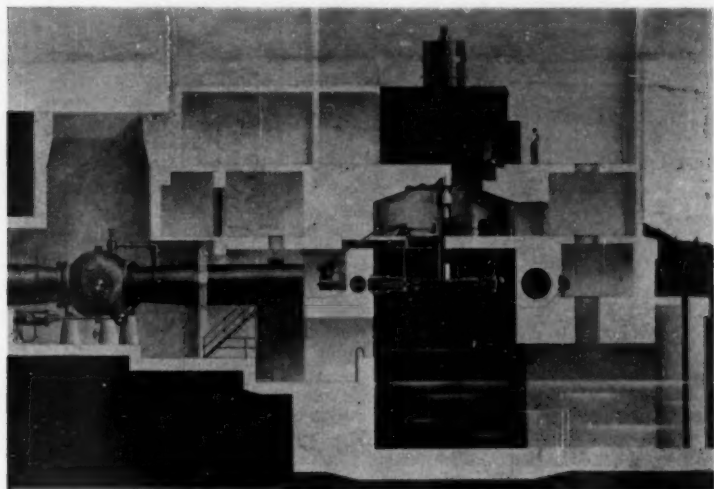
SECTION THROUGH TURBINE-GENERATOR UNIT SHOWING 54-IN. SPHERICAL INLET VALVE
